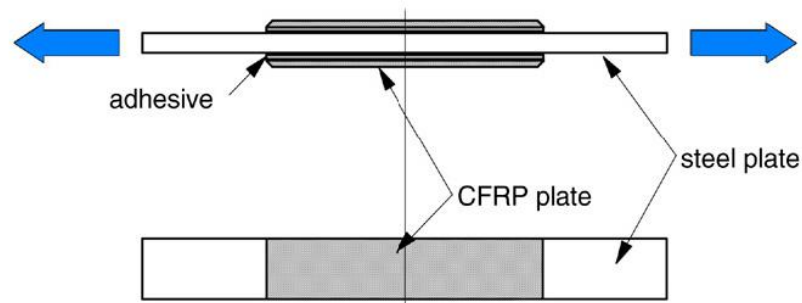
Steel specimens with doubly FRP reinforcement. [6]
